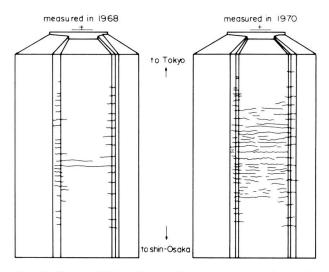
Crack distribution on the concrete surface of a girder of up-boundline
